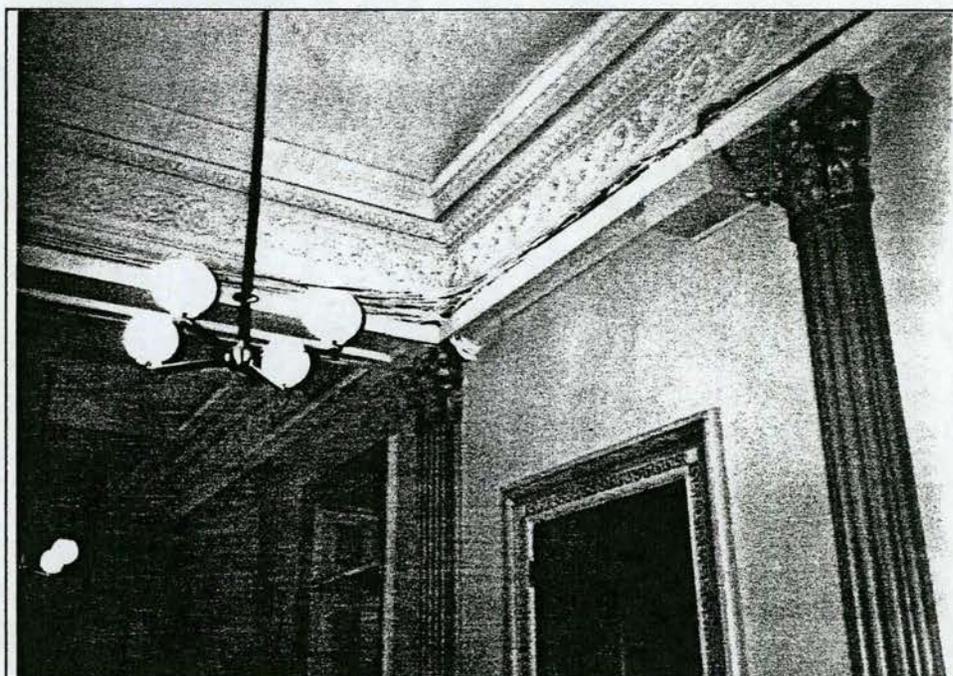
View of cables in over-filled cable shelf at existing cornice line in main corridors.
